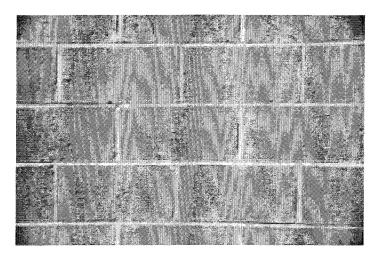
Standard Concrete Block Wall. (Photo: Don Armstrong)
